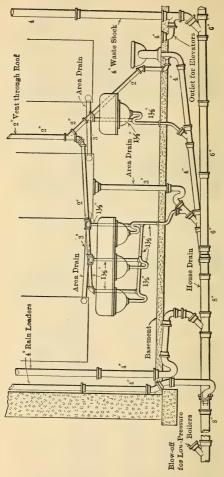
Basement Plumbing in the Hibbs' Building, Washington, D. C.
